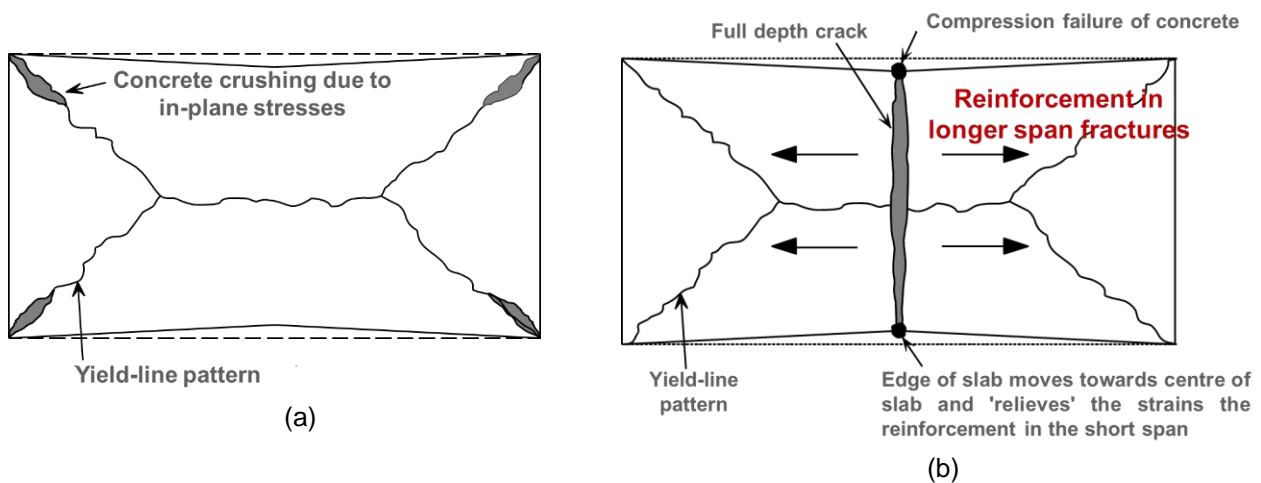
Slab panel yield line mechanism (a) compressive failure of concrete (b) tensile failure of reinforcement.
